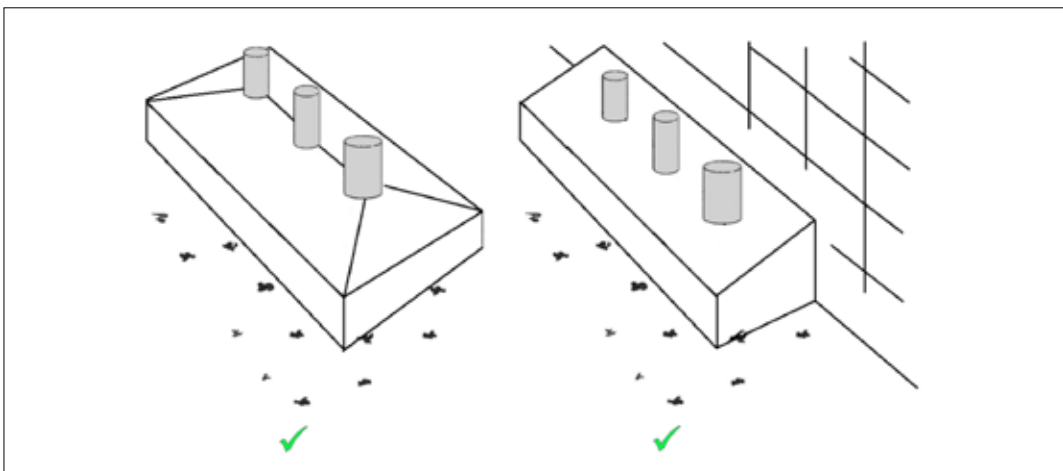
Surrounding of pipes in a curbed floor (EHEDG, 2014).
